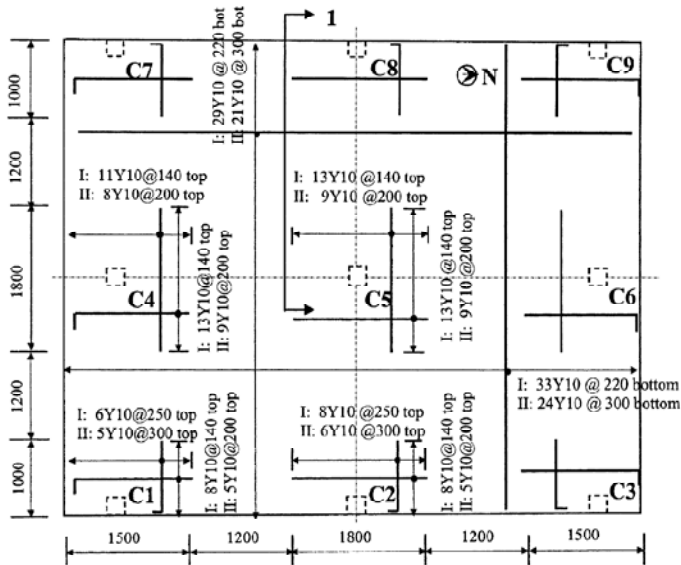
Slab reinforcement shown in plan for slab specimens (Gilbert and Guo, 2005).
